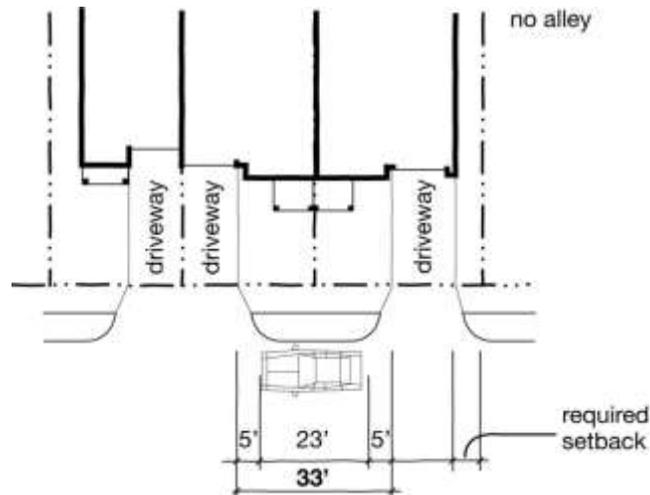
Townhouse, Parking and Access, Location of Garages or Carports
